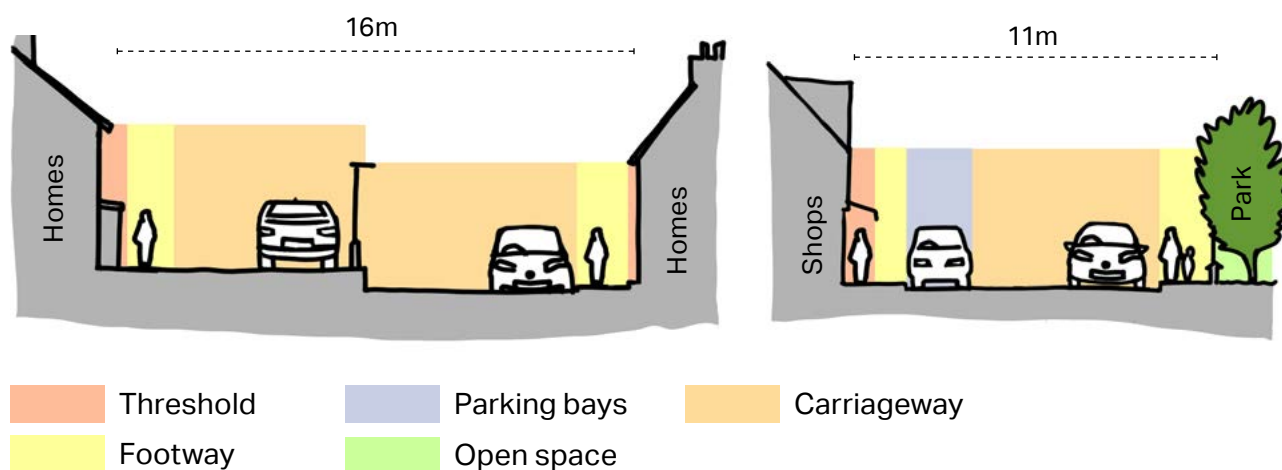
Cross section of Greenway Street (left) and Handbridge (right).
